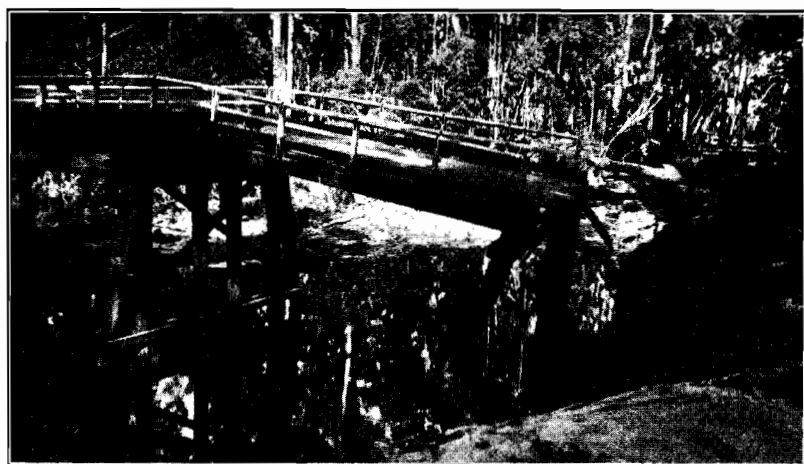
Damage to Tonghi Creek Bridge on the Prince's Highway caused by floods.
